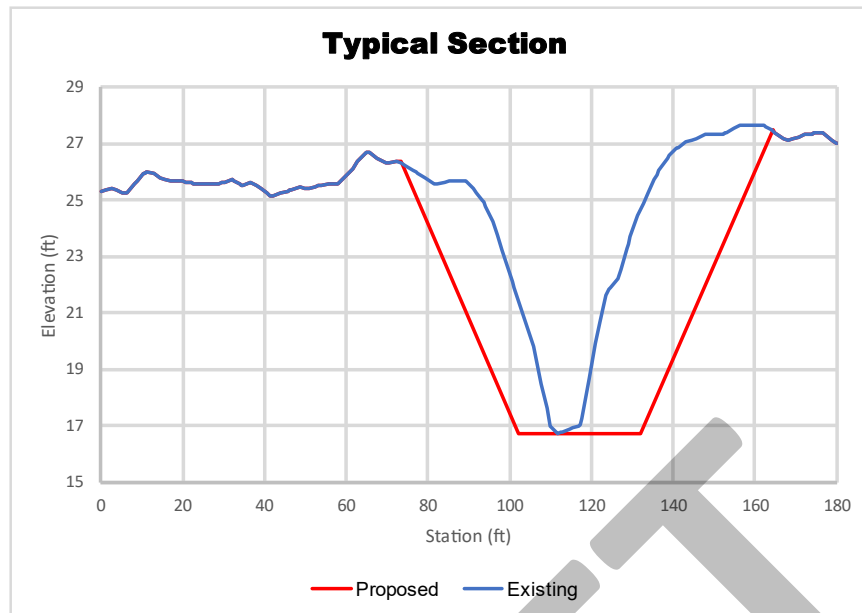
WILLOW MARSH PHELAN DETENTION TYPICAL SECTION
